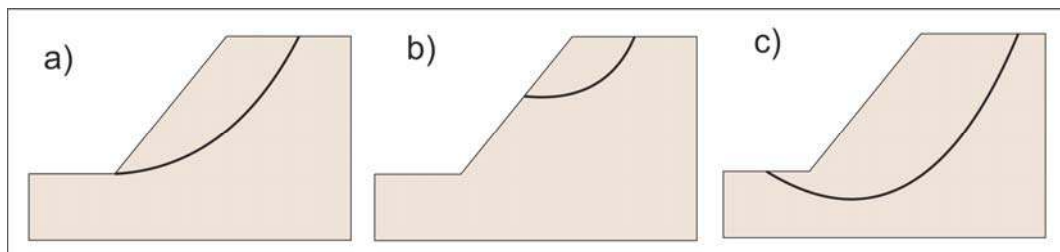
Slope failures of rotational slips; a) slope failure, b) shallow failure, c) base failure
